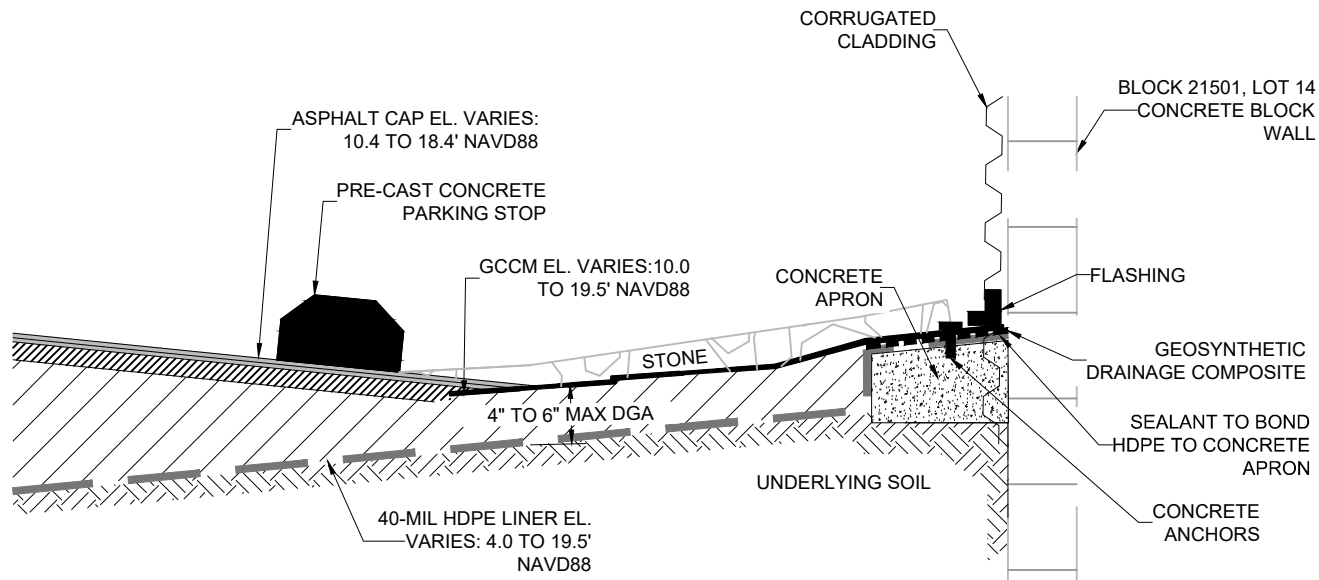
B: Restricted Area Data Table – Restricted Area B – 100 Forrest Street Loading Dock Driveway Existing Asphalt and Concrete Cap
